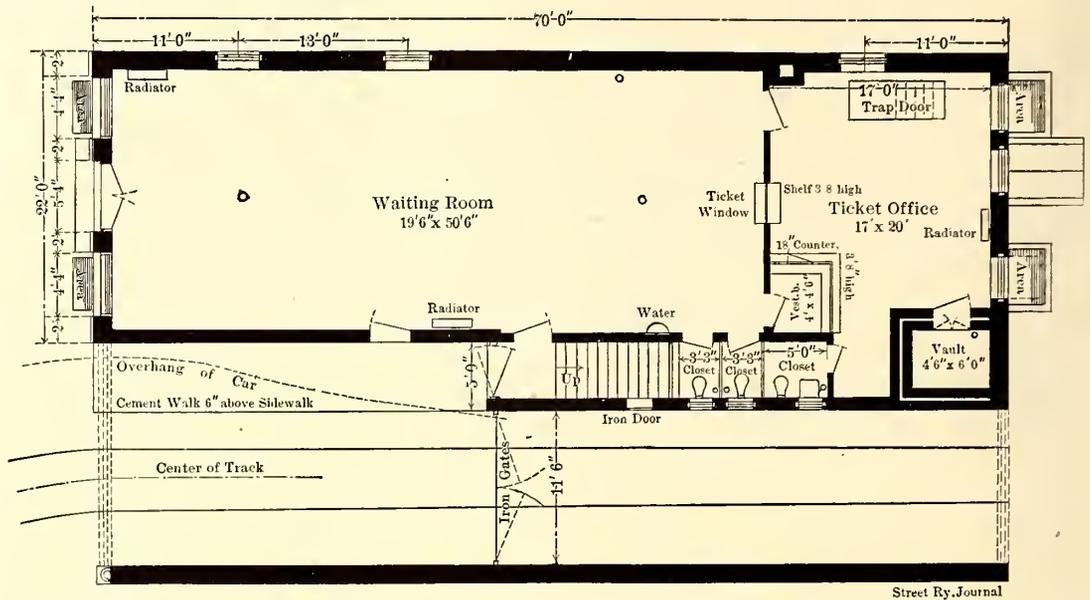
FIRST-FLOOR PLAN OF TERMINAL BUILDING, SHOWING WAITING ROOM, LOCATION OF TICKET OFFICE, ETC.
